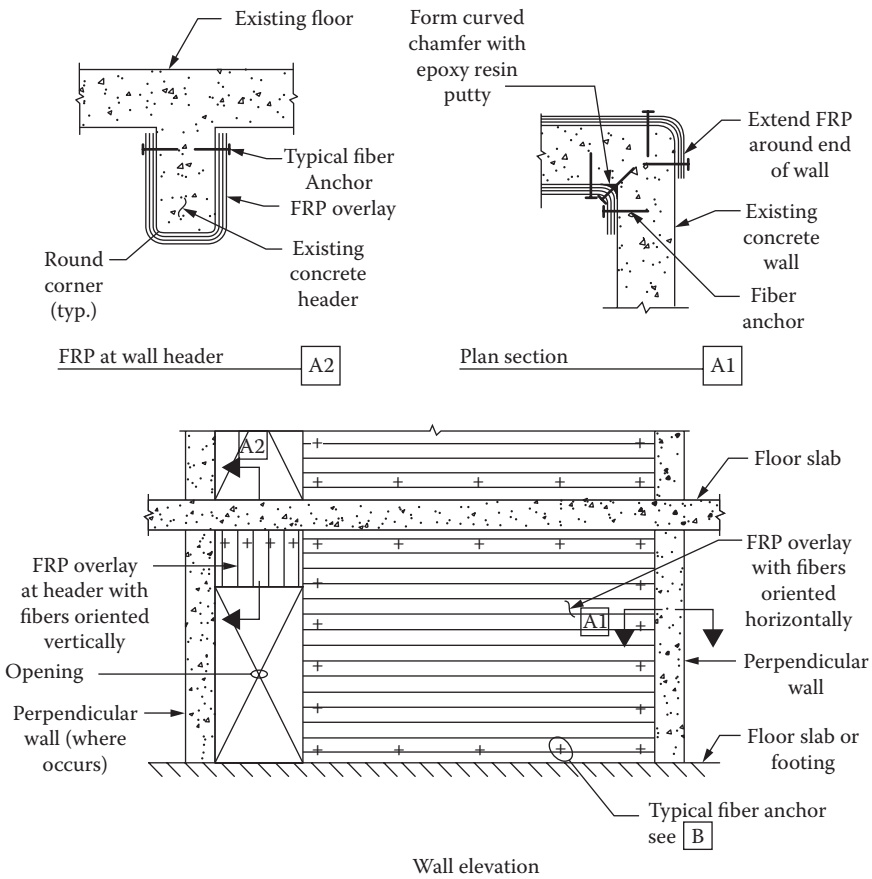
Shear strengthening of concrete shear walls using FRP composite.
